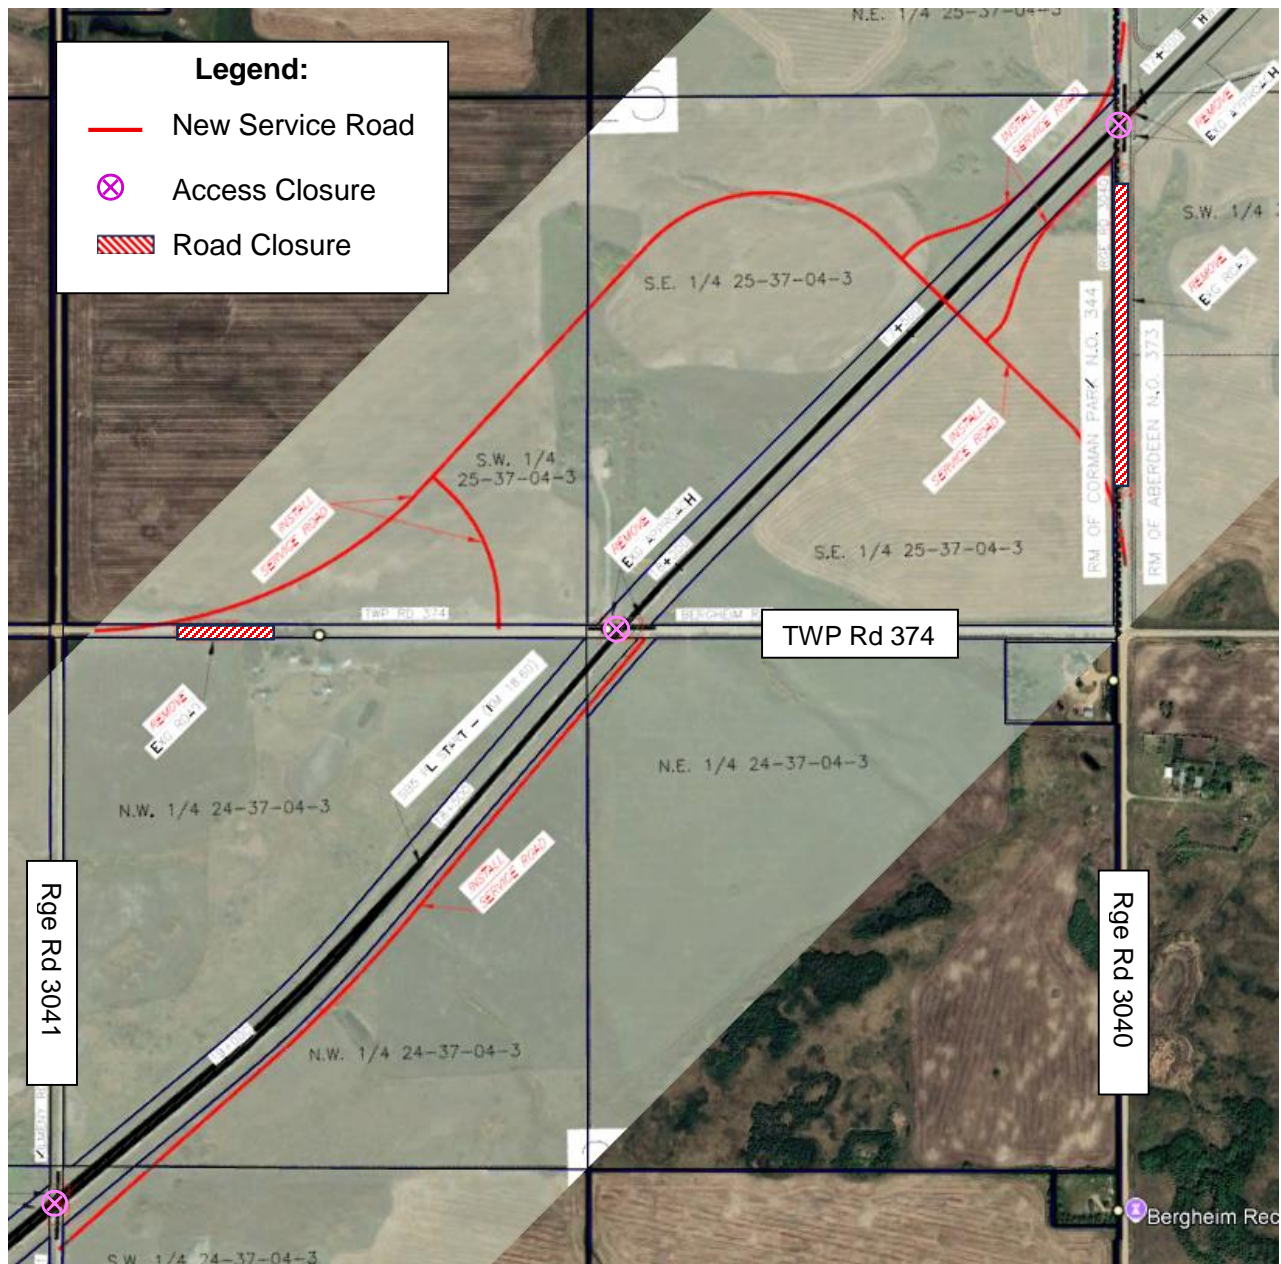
Proposed realignment of Township Road 374, road/access closures, and new service roads along Highway 41 between Range Roads 3040 and 3041.
